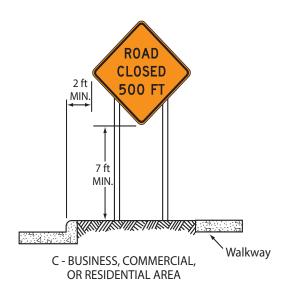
F-1. Height and Lateral Location of Signs -- Typical Installations
